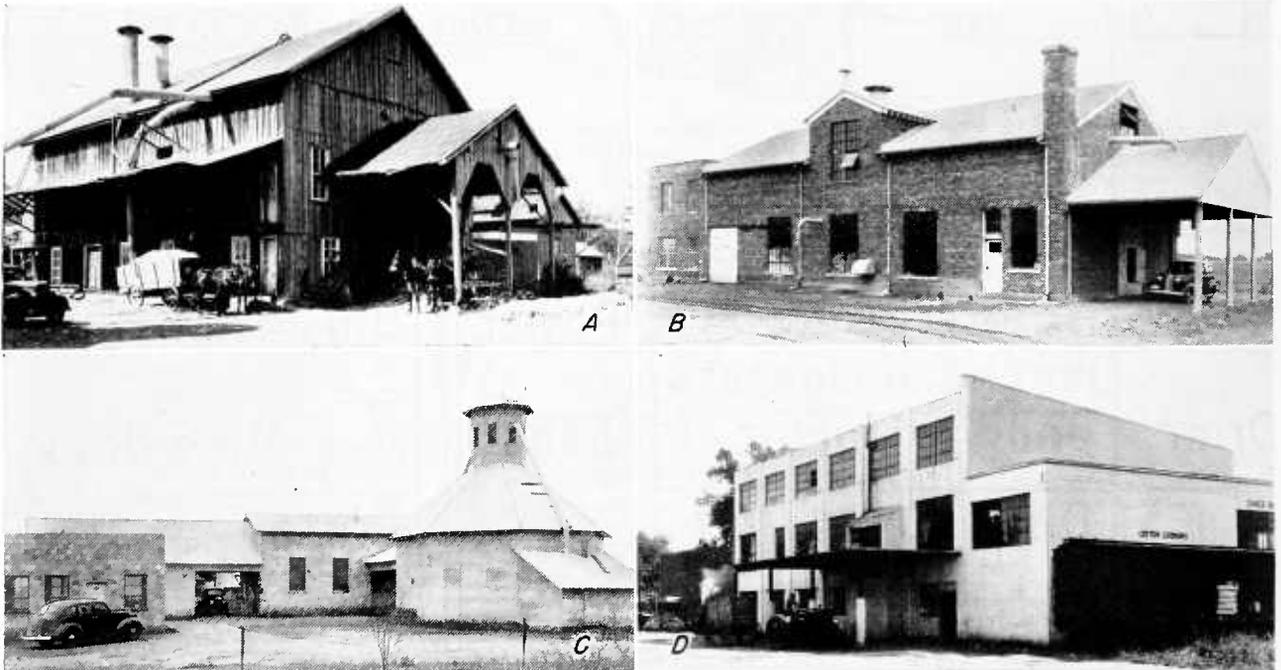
Cotton-gin buildings: A, Old-type wooden construction; B, brick; C, hollow tile; D, concrete.
